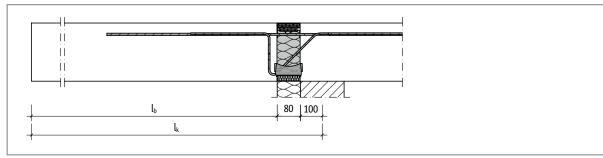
Schöck Isokorb[®] type K: System cantilever length (l_k) for design and geometric cantilever length (l_b)
